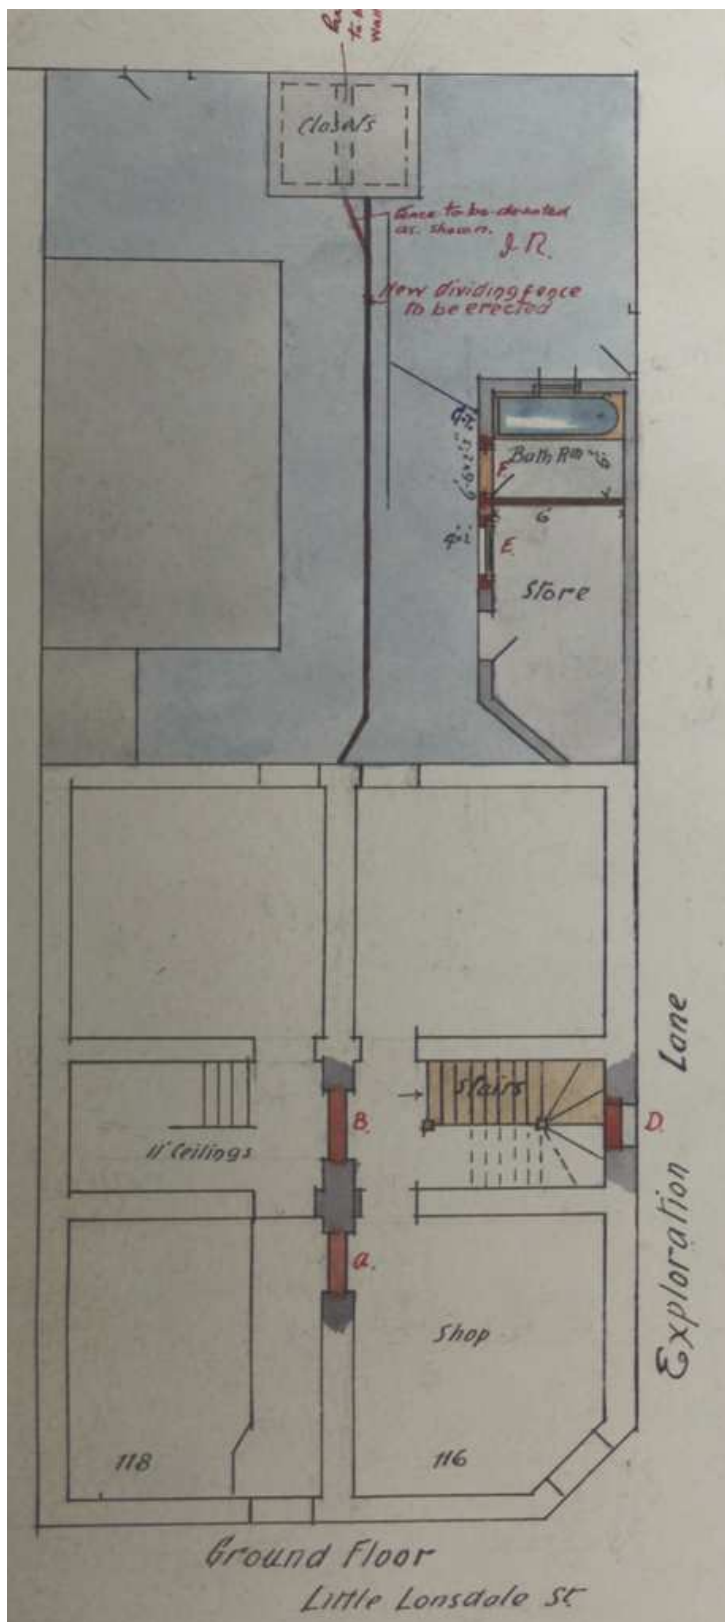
MCC Building Permit application 947 showing the ground floor layout and shop (former hotel bar room) in c1917 (VPR)
